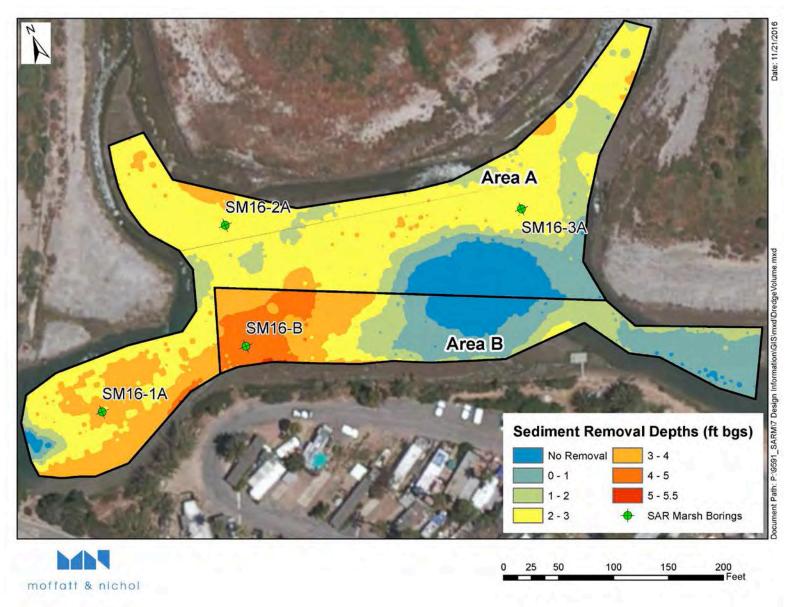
Excavation Depth from Existing Grade to Design Elevation (ft bgs)
